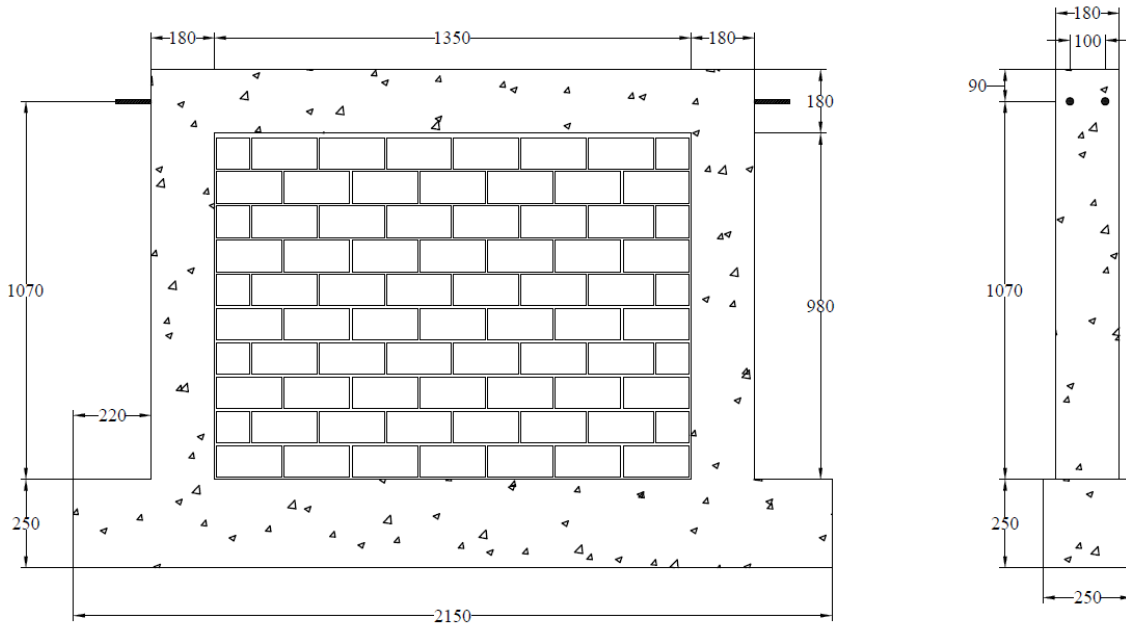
Details of RC Infilled Frame Specimens (unit: mm)
